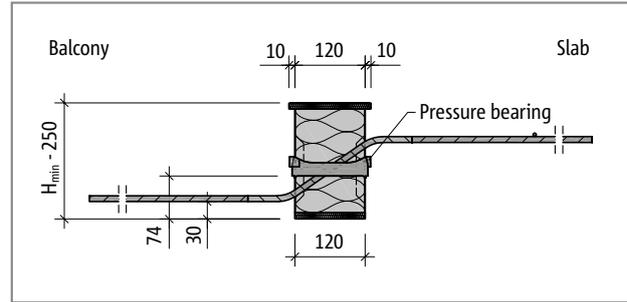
Schöck Isokorb® XT type Q-V5 to Q-V8: Product section
